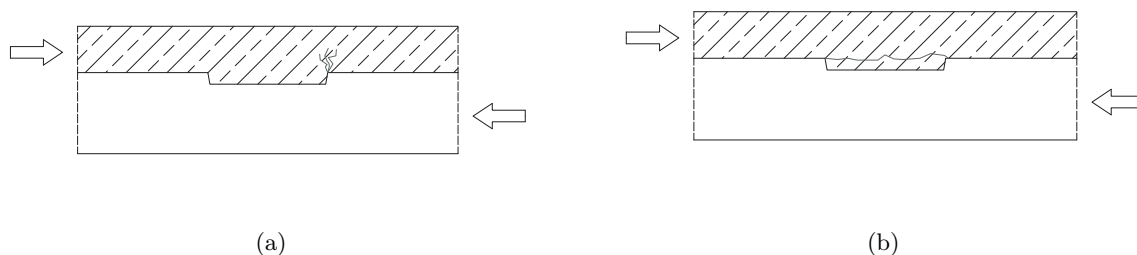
Model to predict the concrete failures in a timber-concrete composite slab with a notched connection according to Michelfelder [33]: (a) tensile stresses in concrete calculated with numerical simulations (b) truss model for the notch design;
